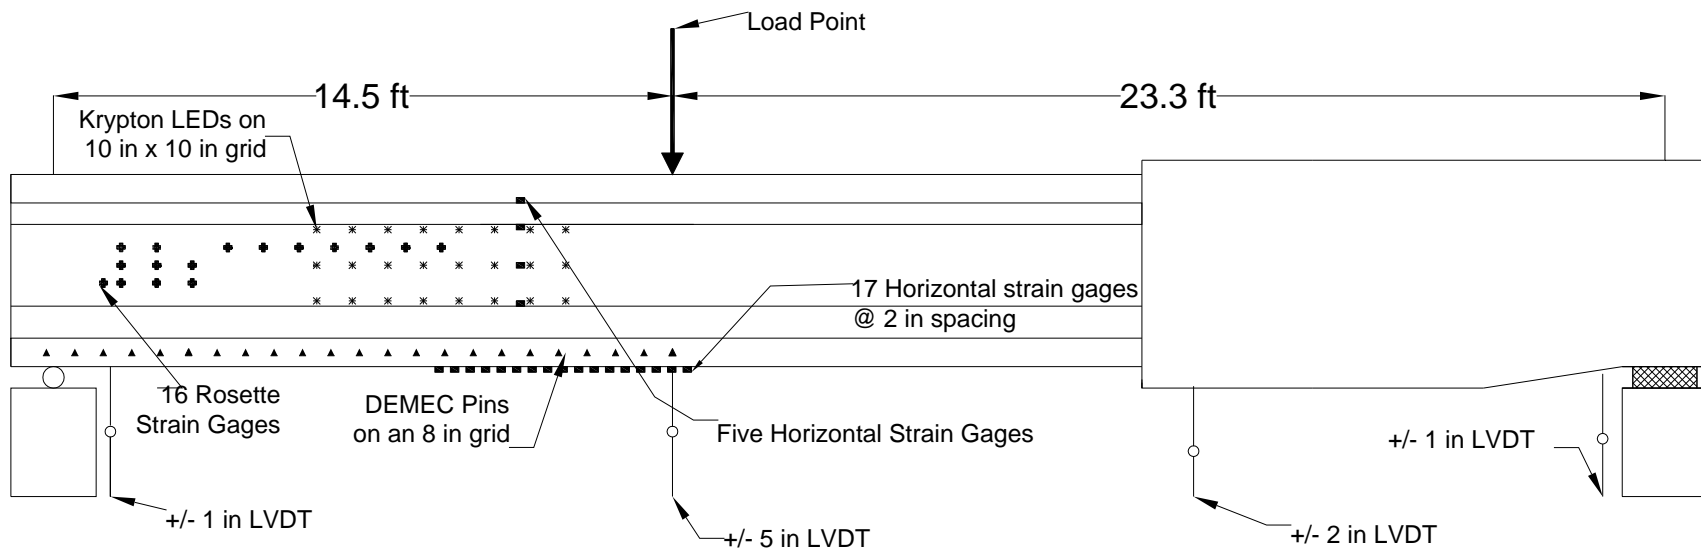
Revised Instrumentation Layout (Specimen II)
